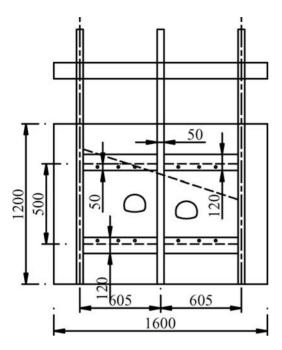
Sketch of steel frame with model tunnel (Unit: mm).
